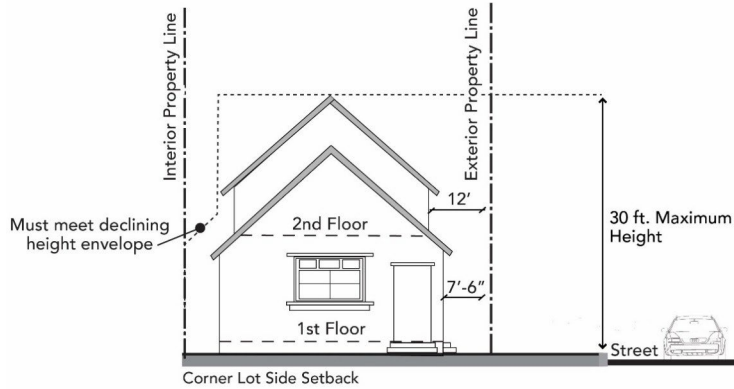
R-1 and R-1 Finish First Floor Exception for Declining Height Envelope
